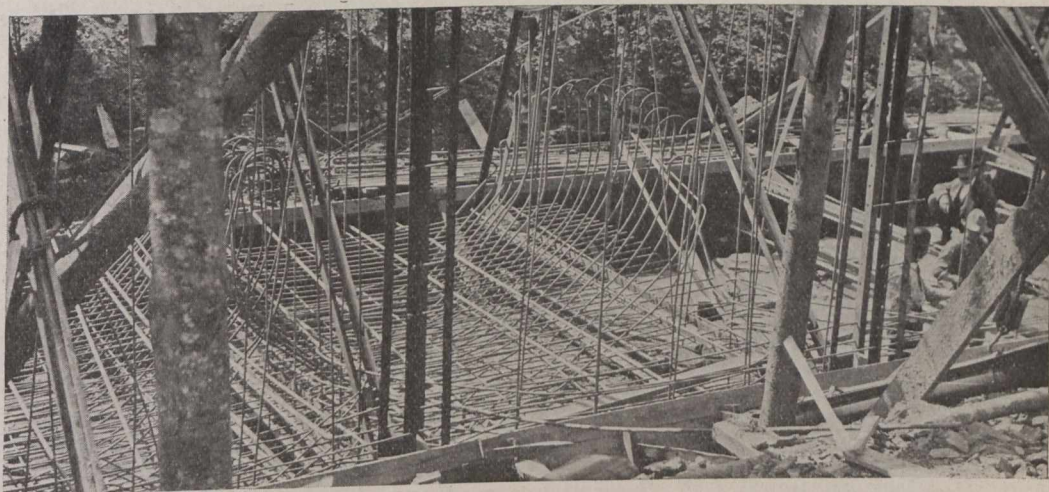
Reinforcing Steel at the Base of One of the Counterforts—West Side Entrance Wall, Port Weller.
